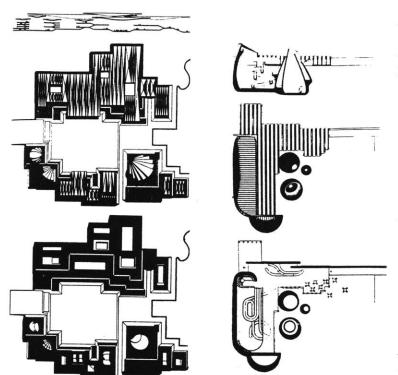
Competition scheme for the Zurich Theater 1964, longitudinal section, roof plan and ground floor plan. (left)
